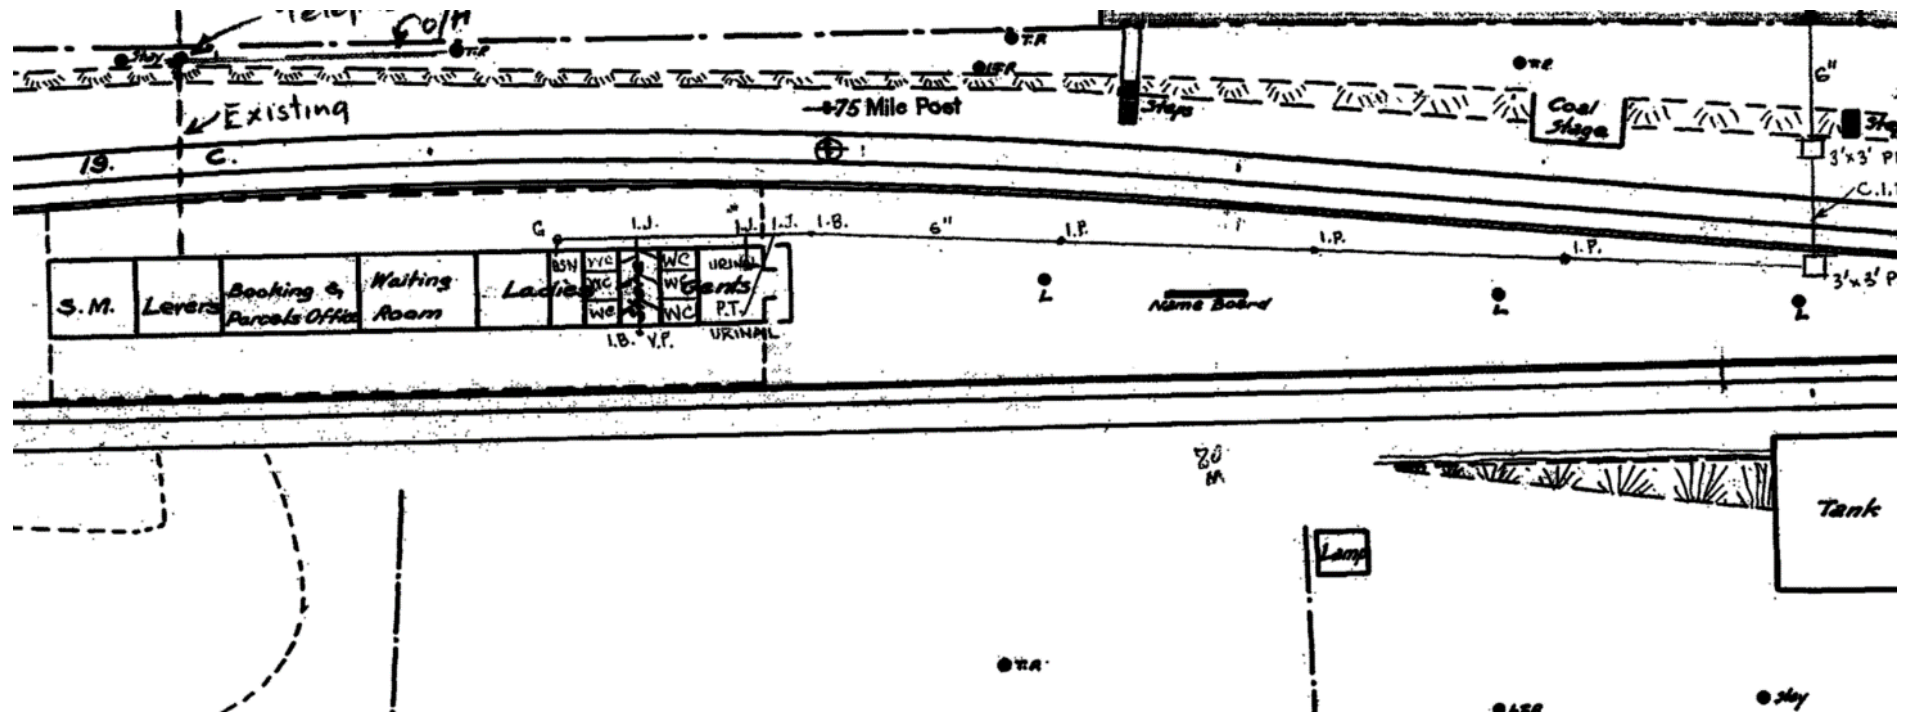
Detail of 1931 plan of Blackheath Station Arrangement showing Blackheath Station Source: Sydney Trains Plan Room, CV0070491.
